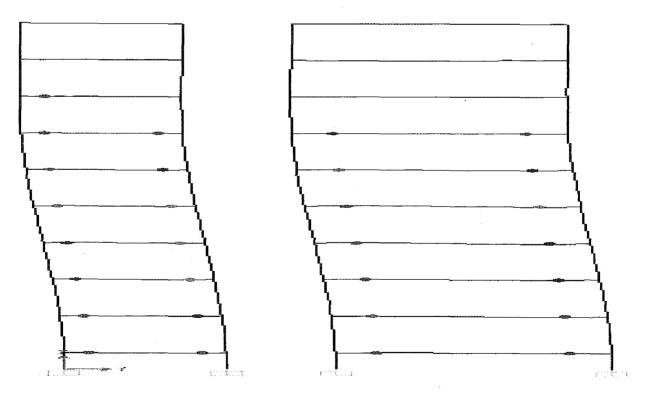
Yield Pattern at Ultimate Point for 9-Storey Building in Transverse Direction Designed as SMRF with Strong Column-Weak Beam
